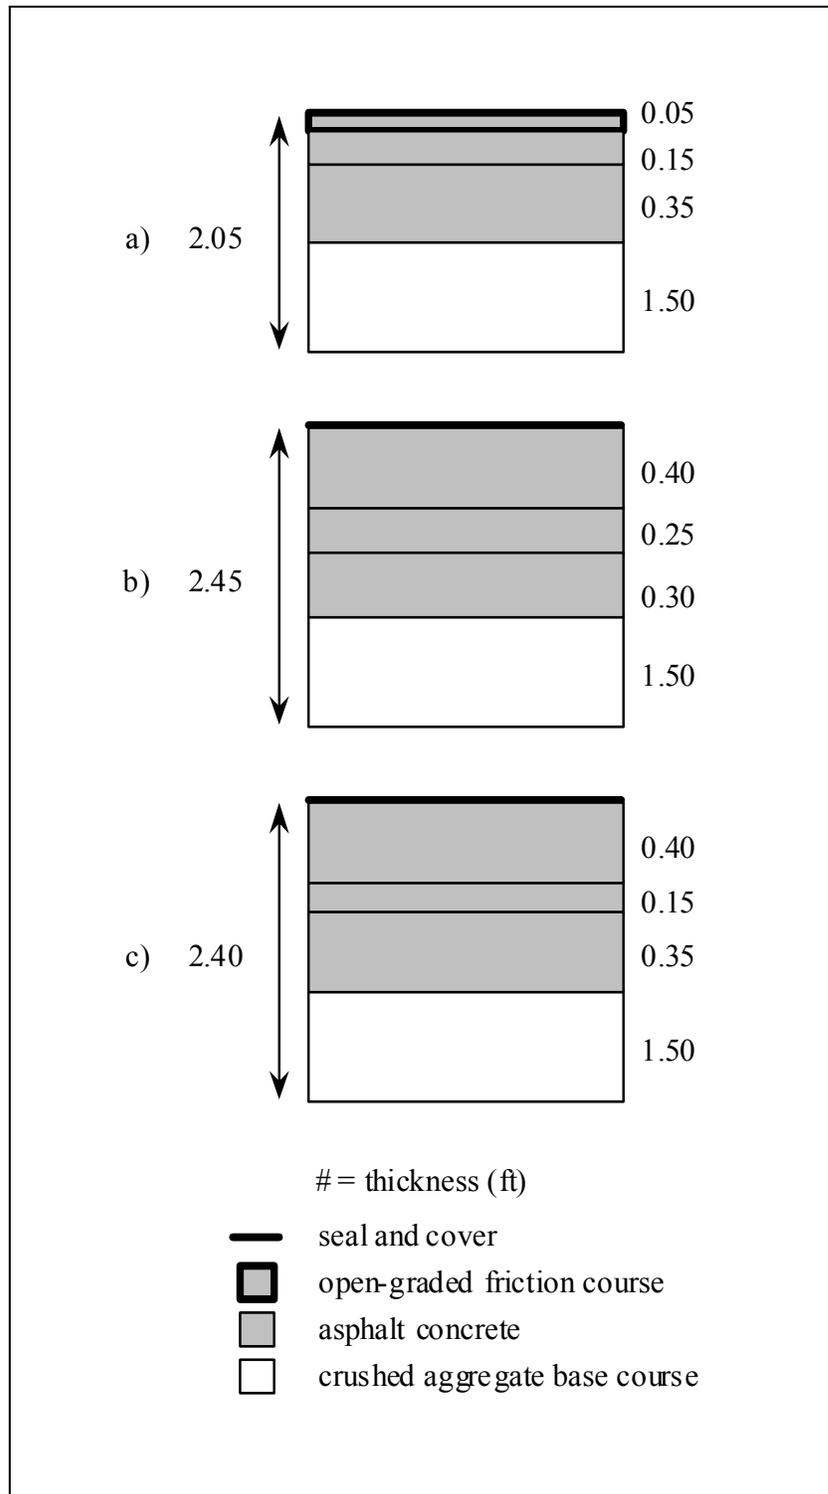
Pavement Cross-Sections at Custer County Line West: a) original pavement, b) control section, and c) test section
